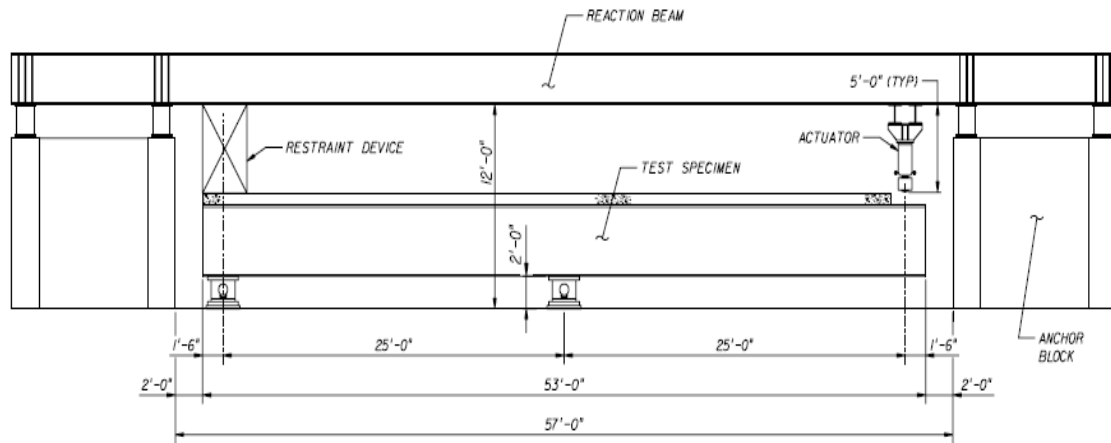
Initial Testing Layout Using the Reaction Frame Assembly
